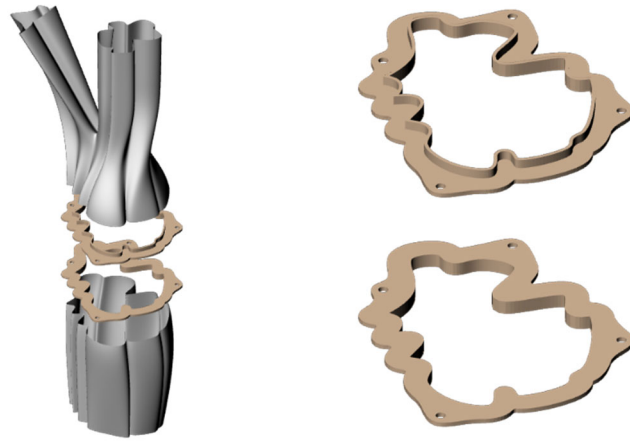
, 102 accordingly: (Left) Column pieces with joint pieces. (Right) Joint metal pieces. Own work.
